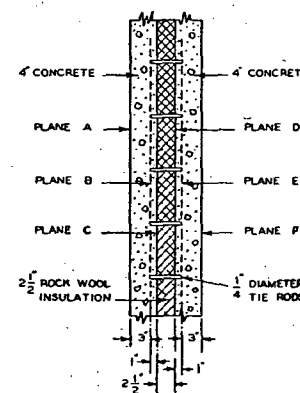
SECTION OF CONCRETE WALL HAVING STEEL TIE RODS AND INSULATION
